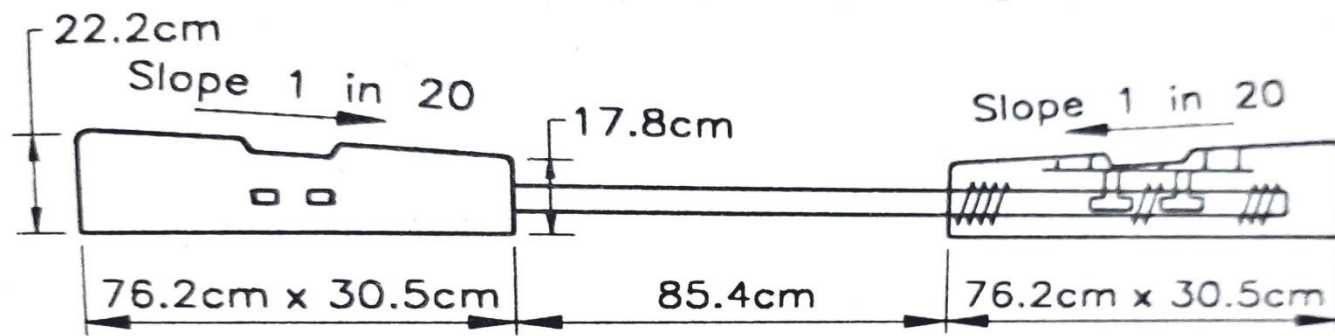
Reinforced Concrete Sleeper (Composite Type).
